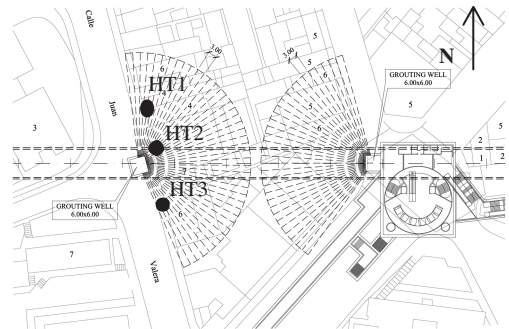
Compensation grouting performed at the Juan Valera road zone. Plan view.
